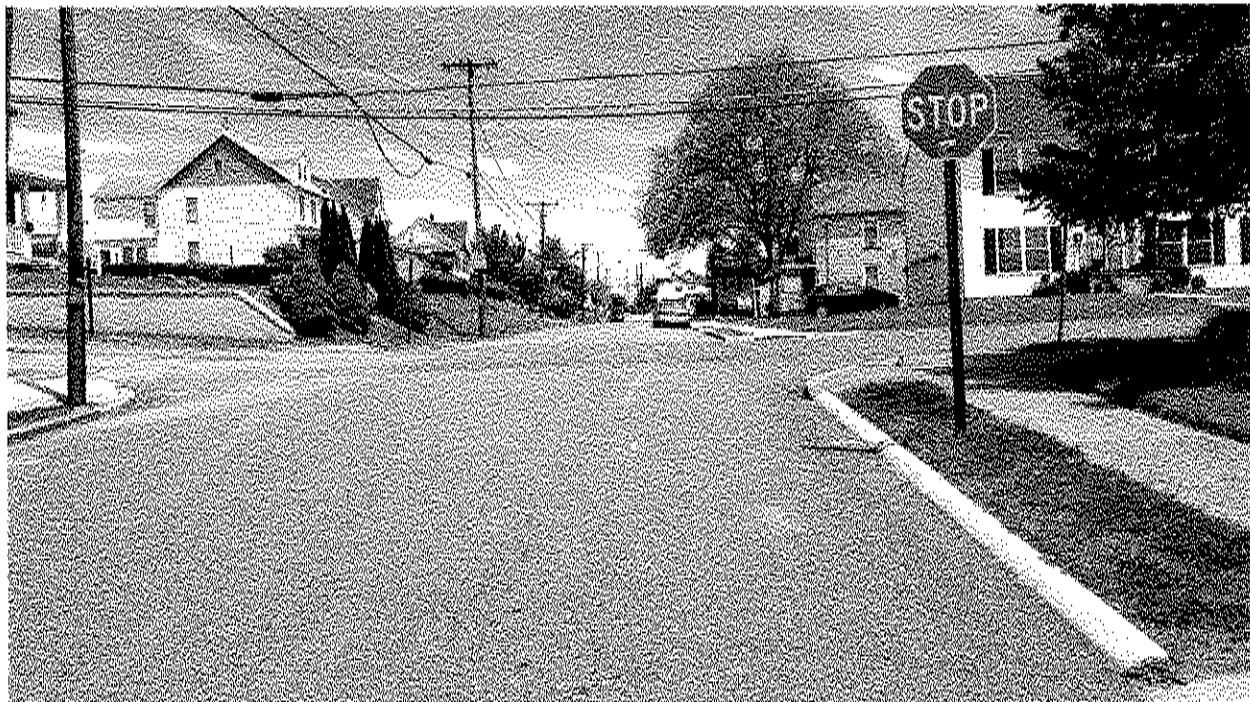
View from Pursel Street at intersection Wilbur Street looking towards Green Street
